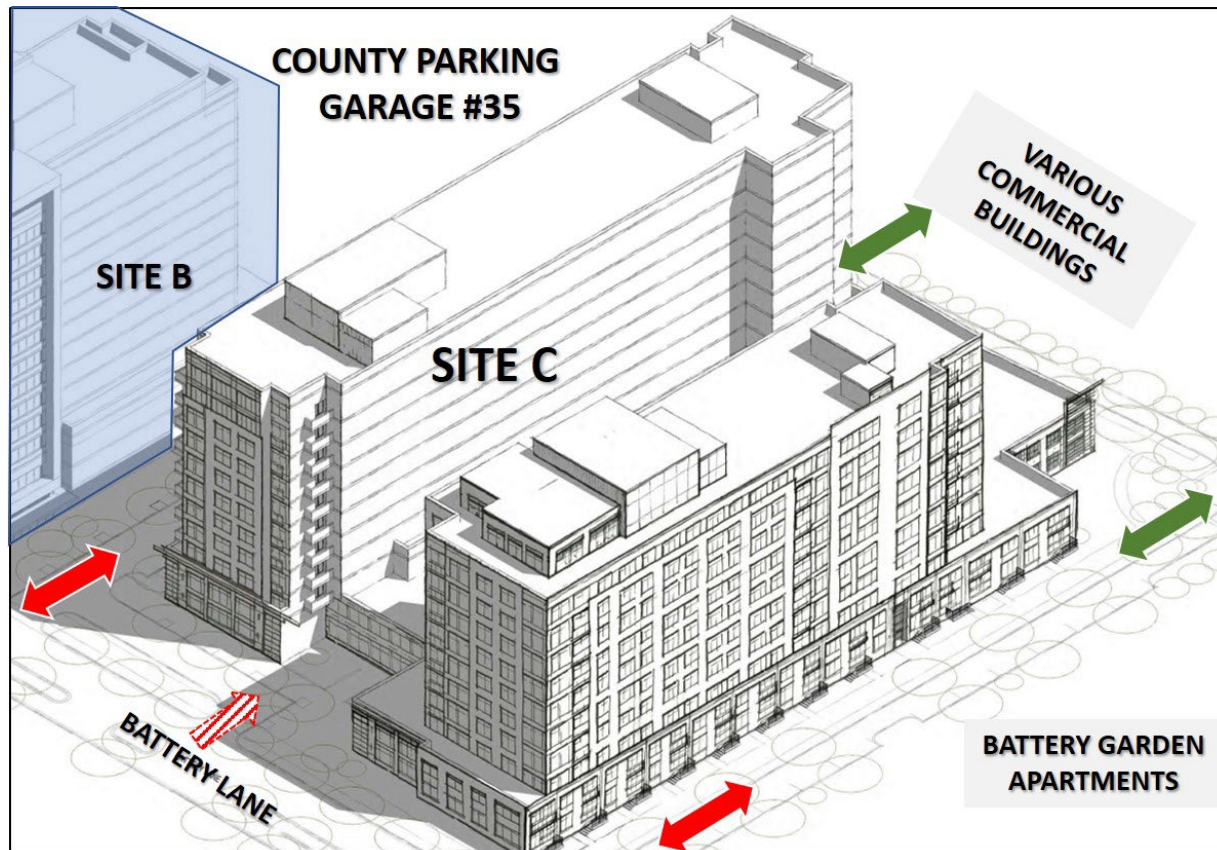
Sketch Plan Site C massing looking south from Battery Lane
